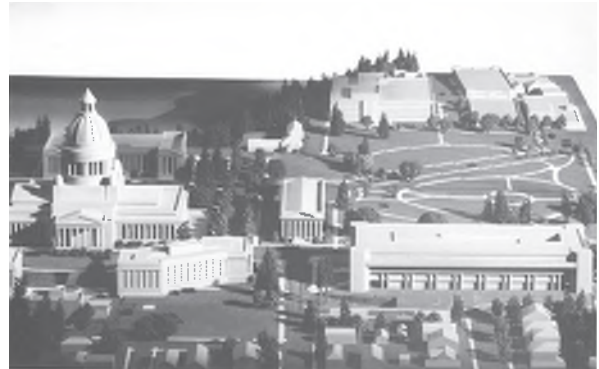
1974: EXECUTIVE OFFICE BUILDING
